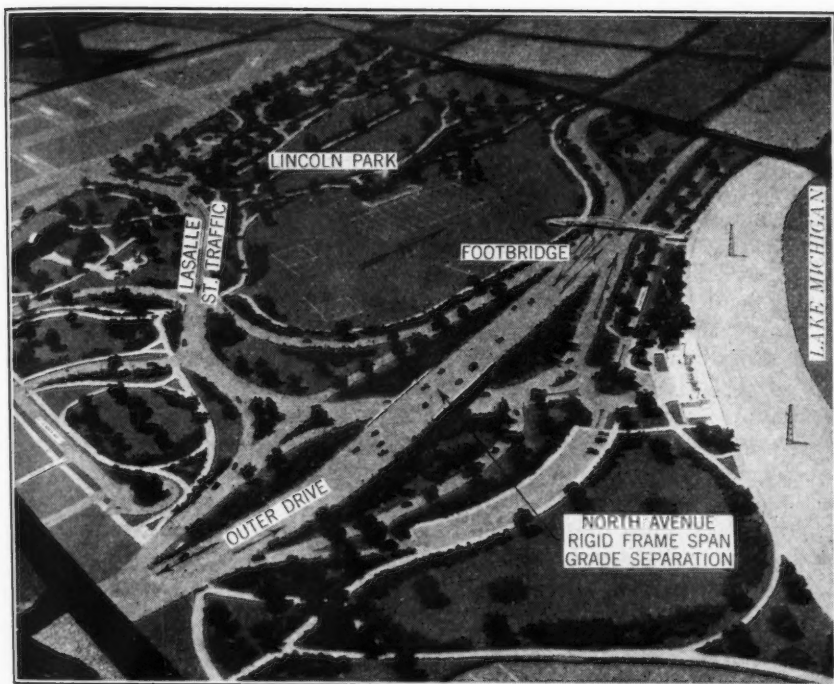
MODEL SHOWING LAYOUT OF PROJECT
